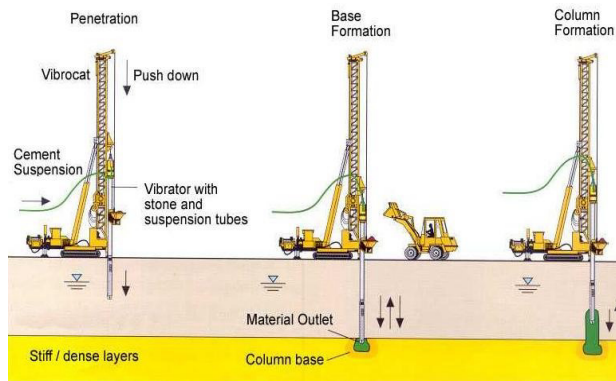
Schematic showing the installation of Grouted Stone Columns.
